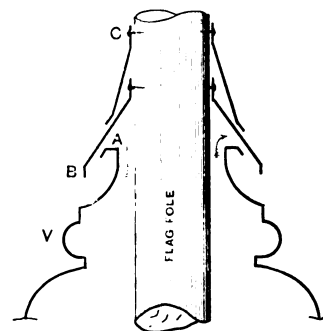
Section Showing Water Tight Joint at Flag Pole.
